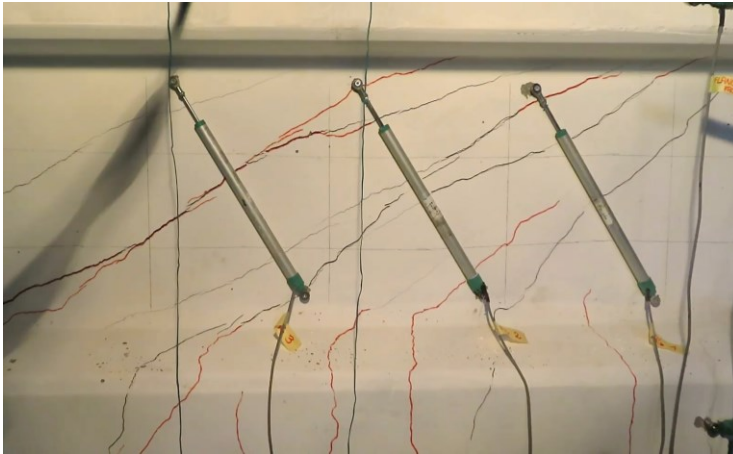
Crack pattern at the load of 790 kN – Beam B.
